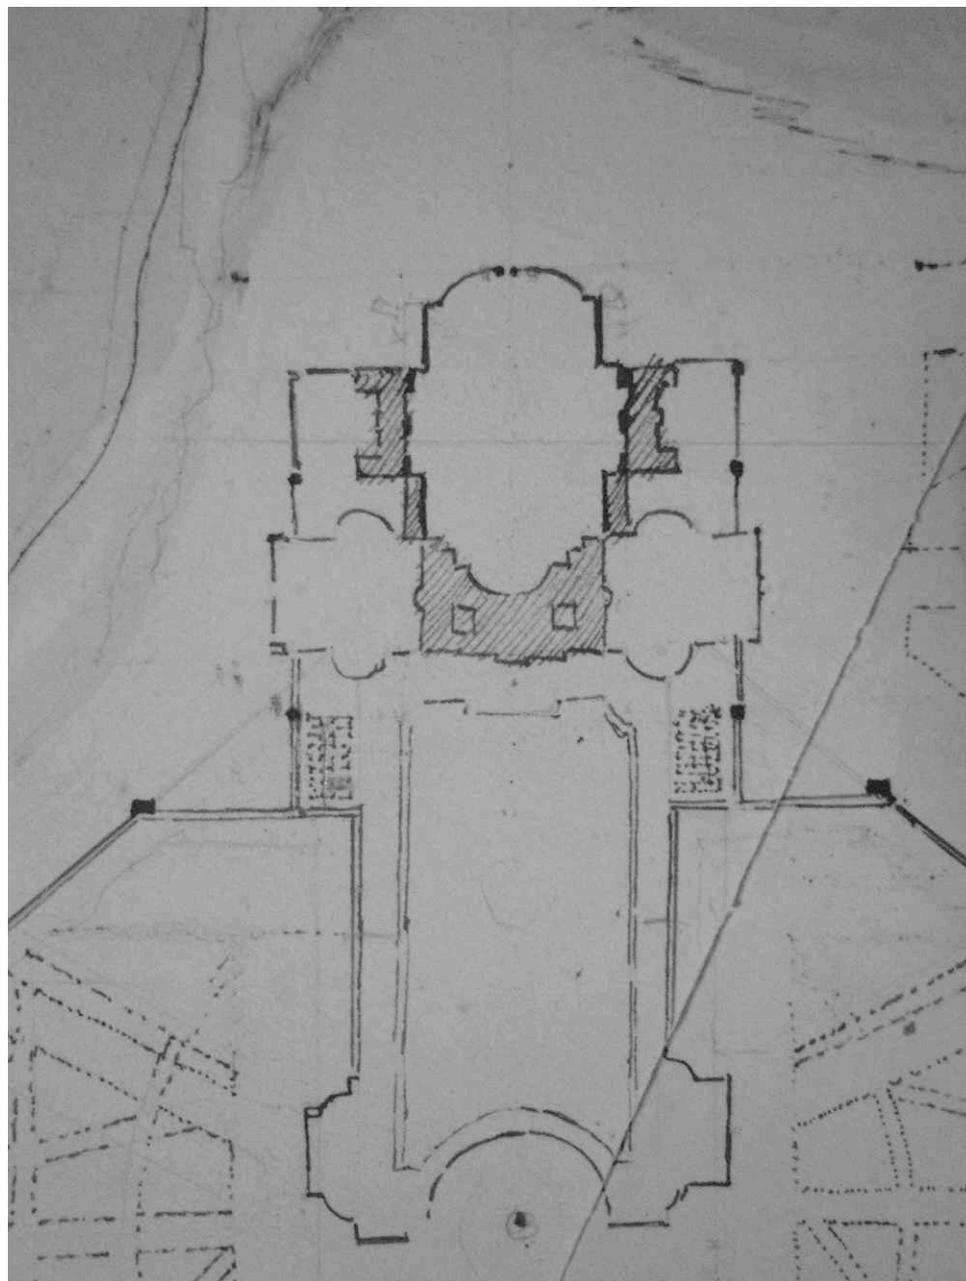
Detail of fig. 13, Nicholas Hawksmoor and Henry Joynes, *Site Plan of Blenheim Palace and Woodstock Park* (photograph: the author)
